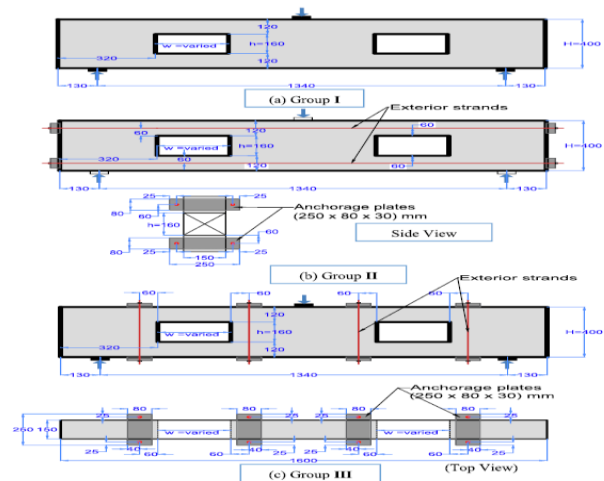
The layout of tested beams (all dimensions are in mm)[45].
